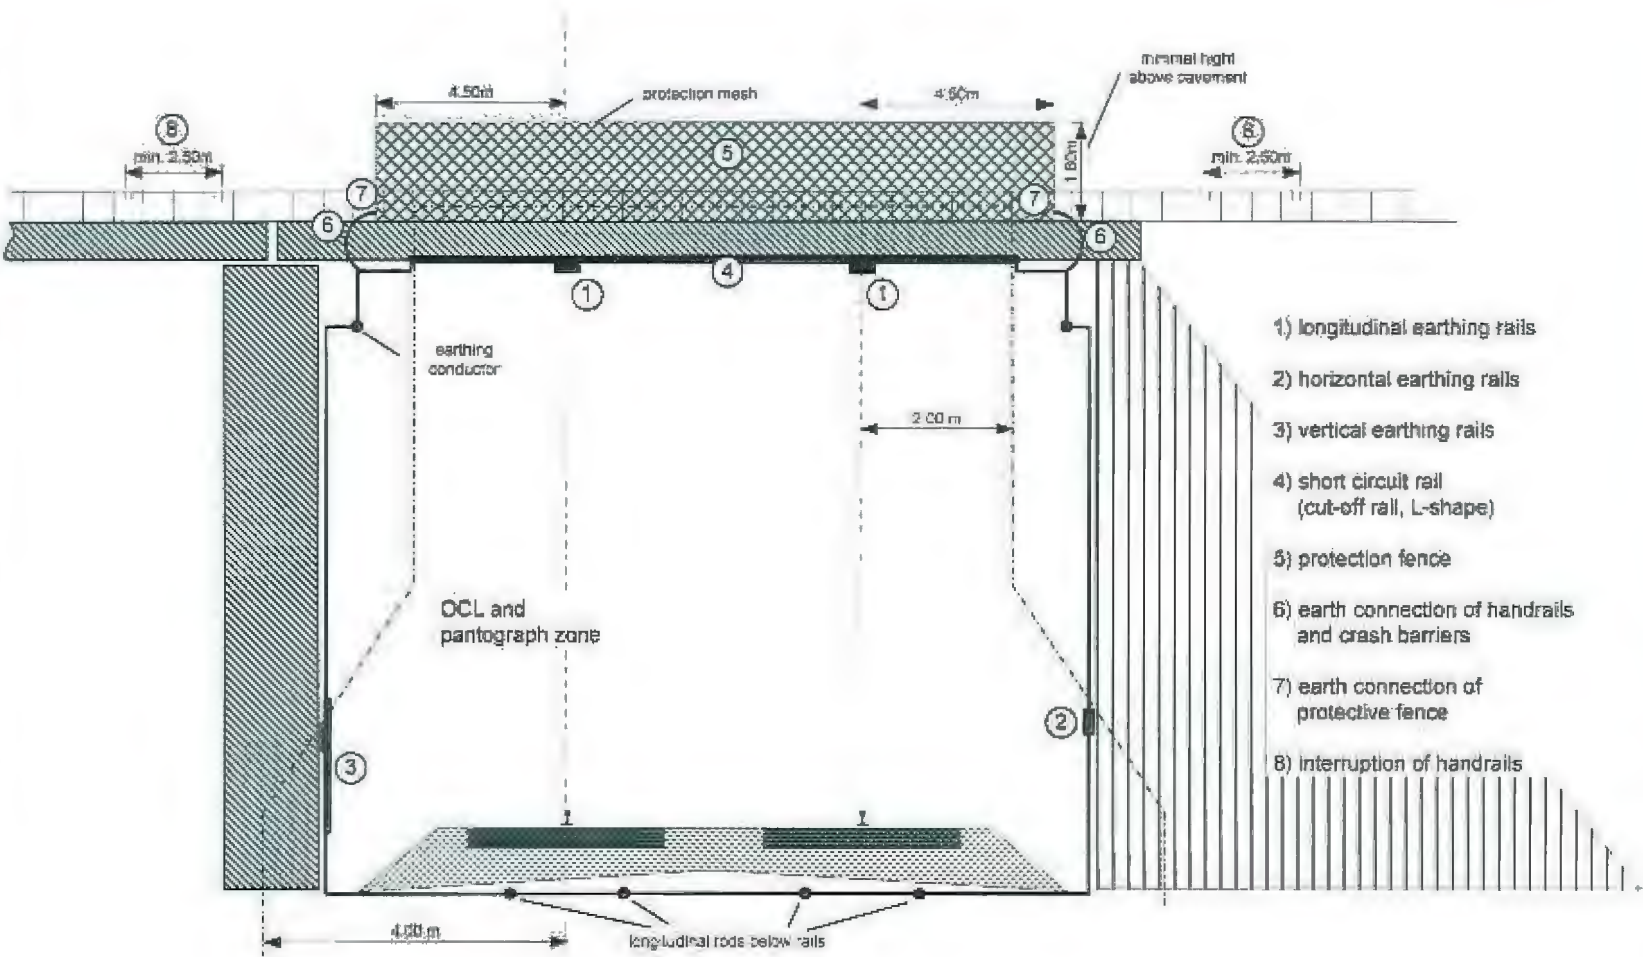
Earthing of existing Structures (Typical arrangement)
